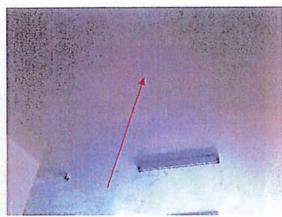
View of plaster ceiling skim coat (HA-E) in various areas of the building.
